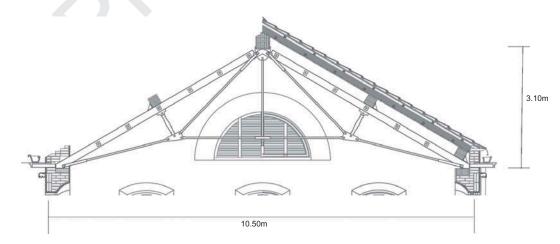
Nave roof system, original layout. The steel truss structure (primary system) is shown in white, while the original timber structure (secondary system) is highlighted in grey.
